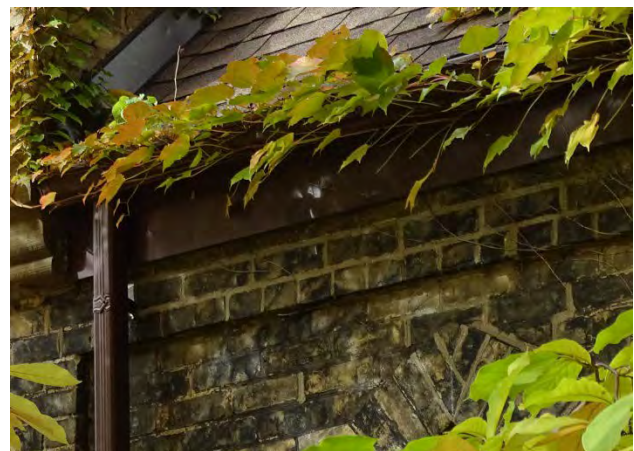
South Elevation – Nave Fascia (Photo No. 11.2)
